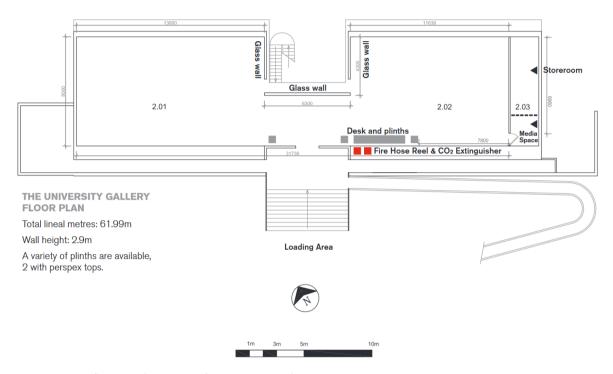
Gallery floor plan (University of Newcastle, 2013)
